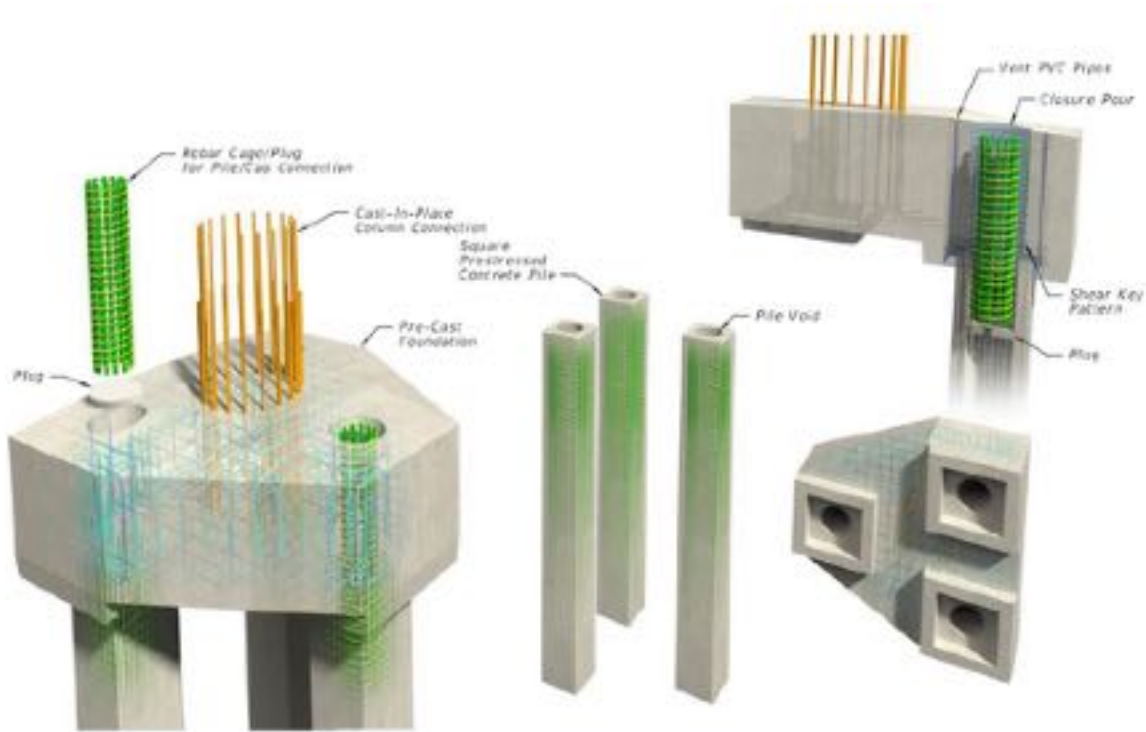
Precast Footing Connection use for FDOT (Florida Department of Transportation, 2017).
